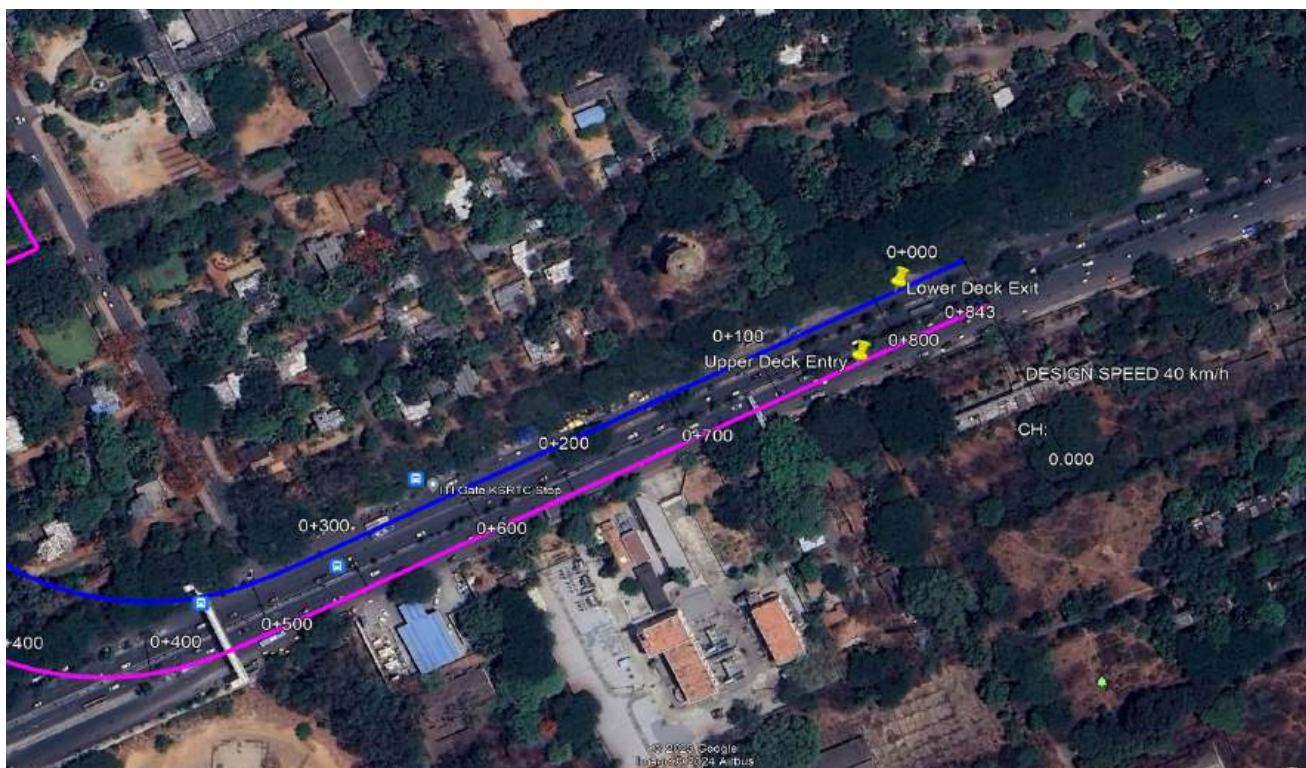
Upper Deck Entry and Lower Deck Exit (Near KR Pura)
